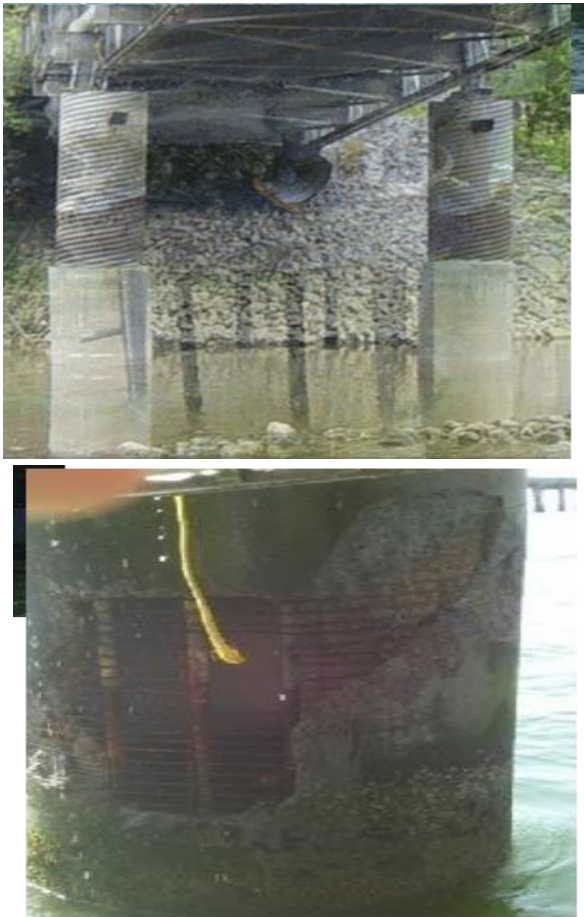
Strengthening the bearing capacity of the pile foundation structure
